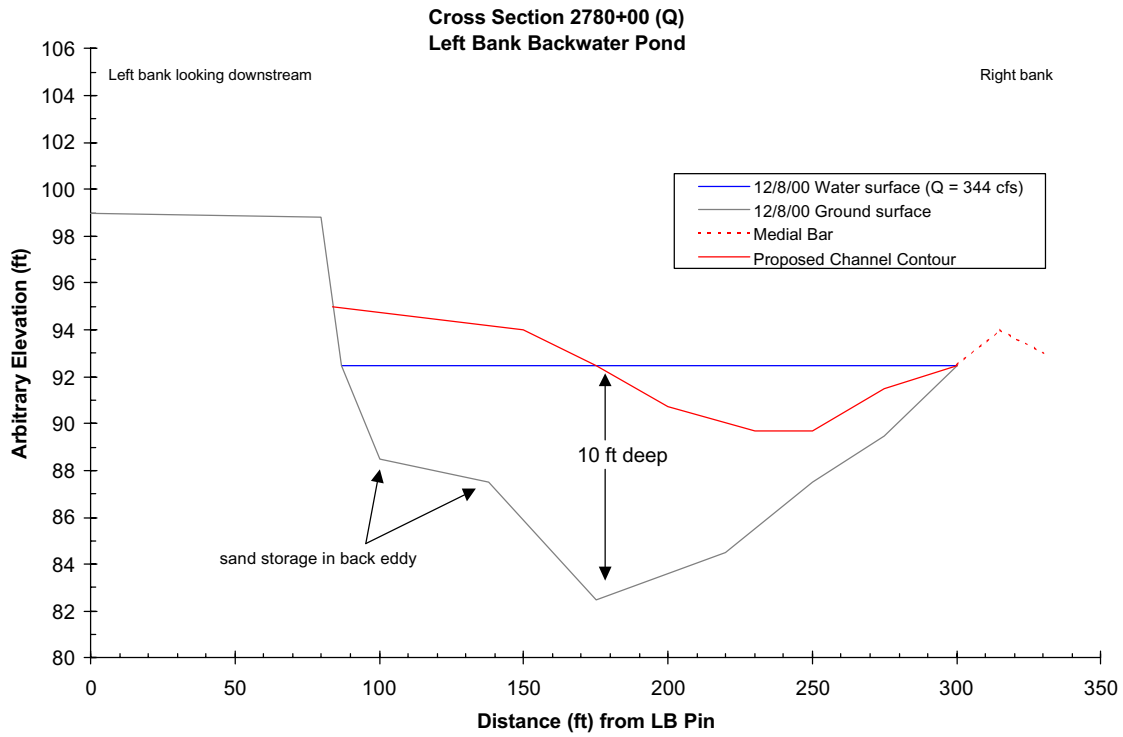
Cross Section 2780+00 traversing the left bank backwater pit that was left from dredger mining operations. Filling the pit would reconfine the low water channel.
